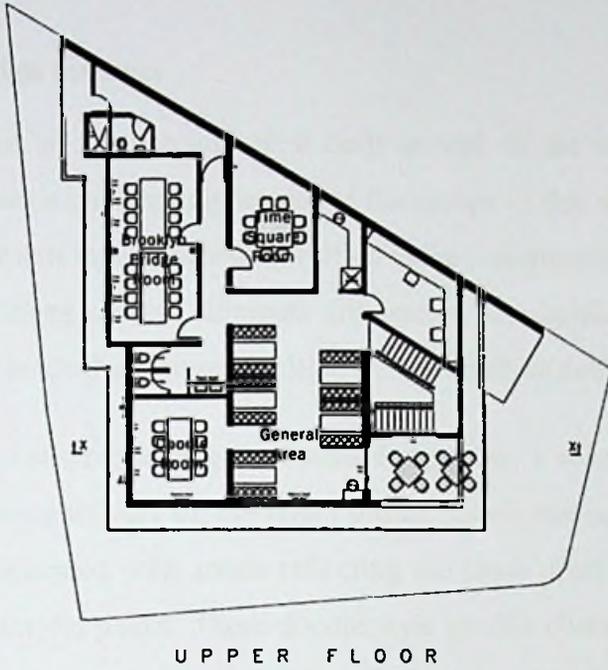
Manhattan Fish Market – Space planning – Upper floor (not to scale)
